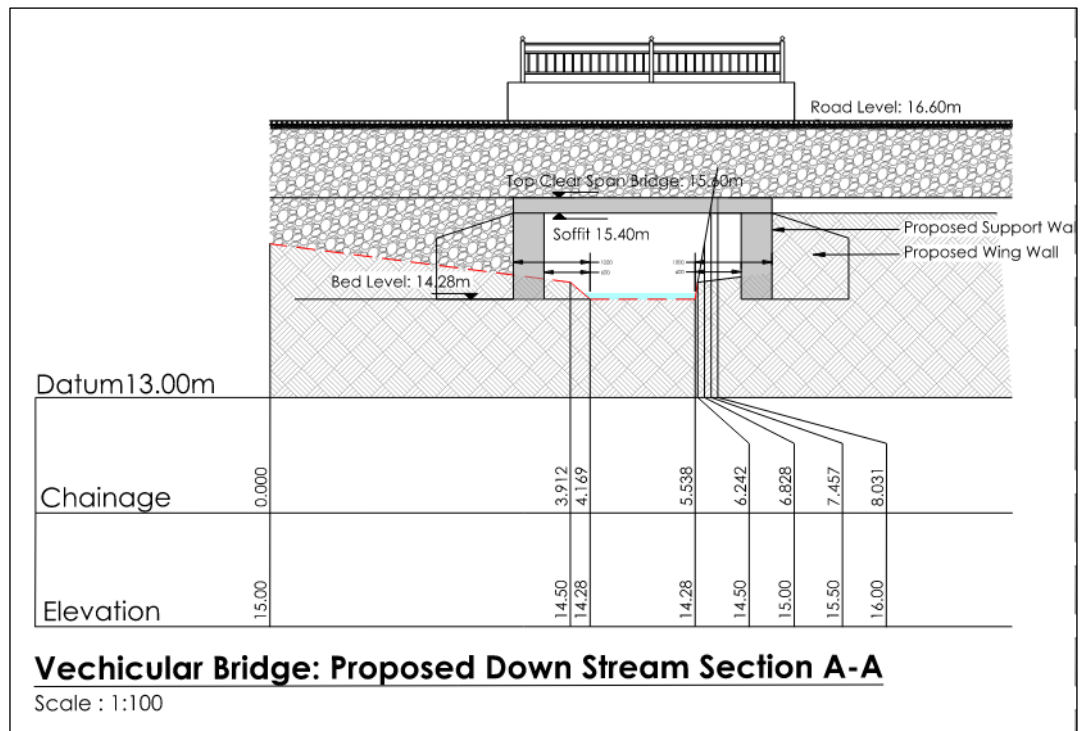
Proposed Bridge Elevation (Extract from DOSA drawing 5958-0013)#
